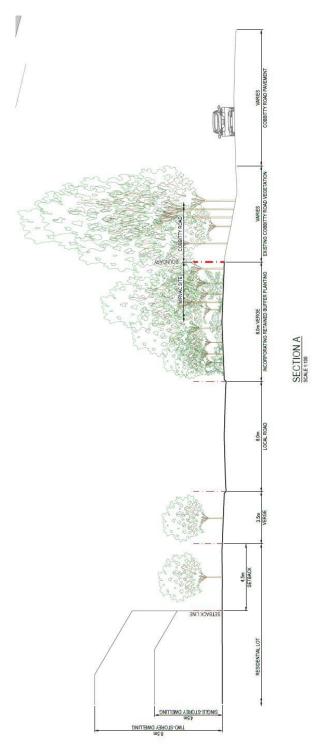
Proposed cross section for perimeter road parallel to Cobbitty Road
